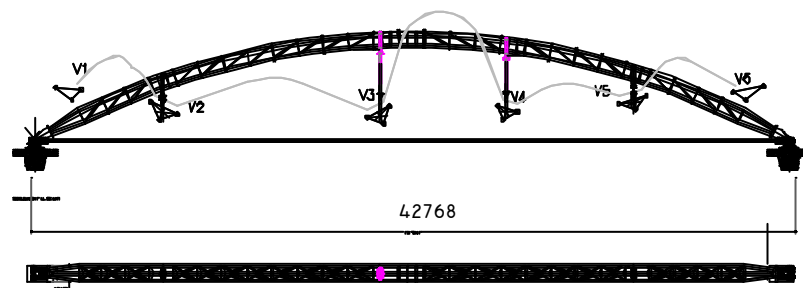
General cross section of cover by the steel arches, wood arches and steel beams
